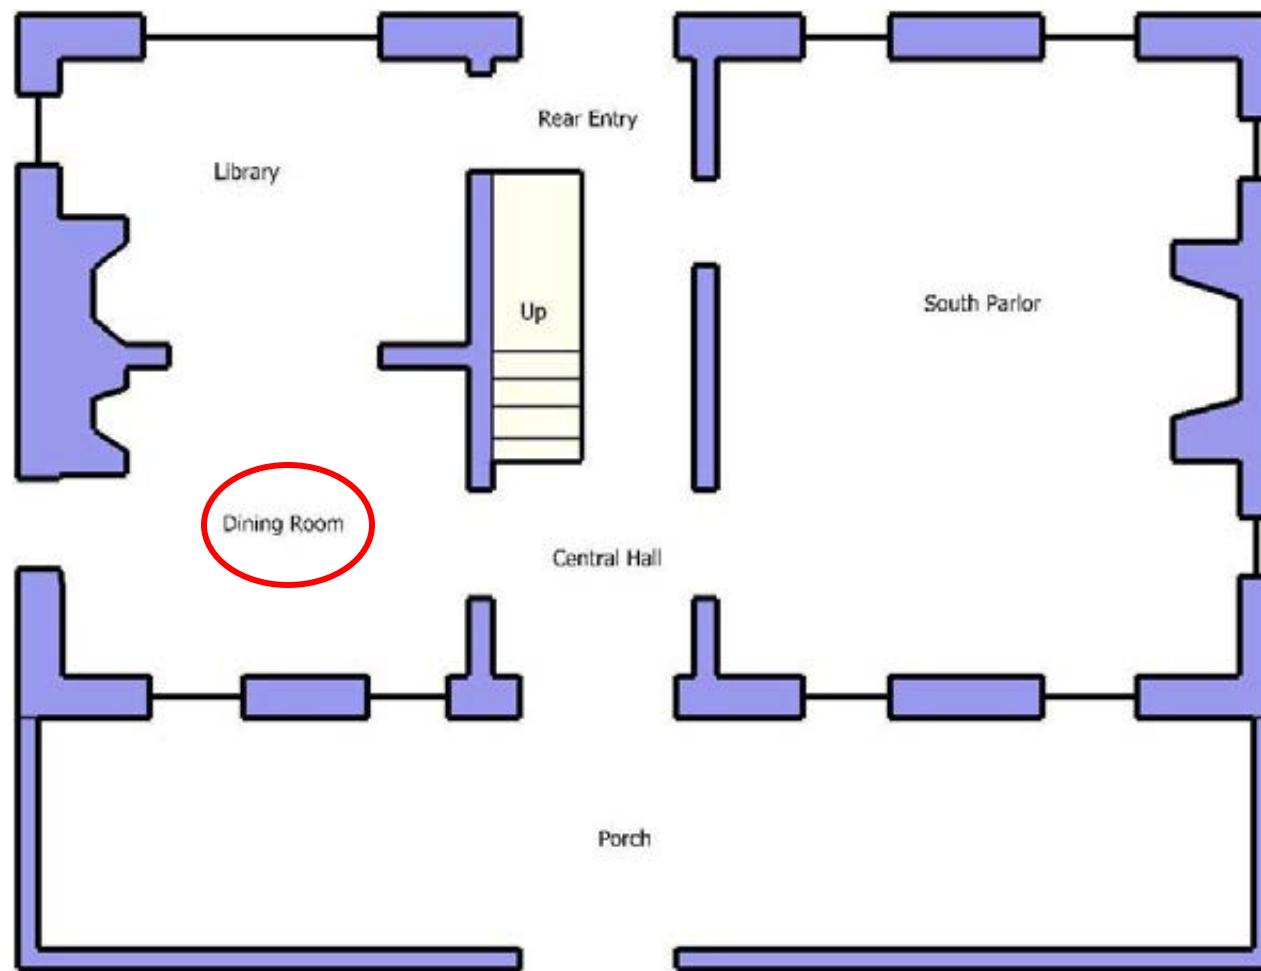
Plan showing Bostwick's dining room. Drawing by Kathleen Manicke.
